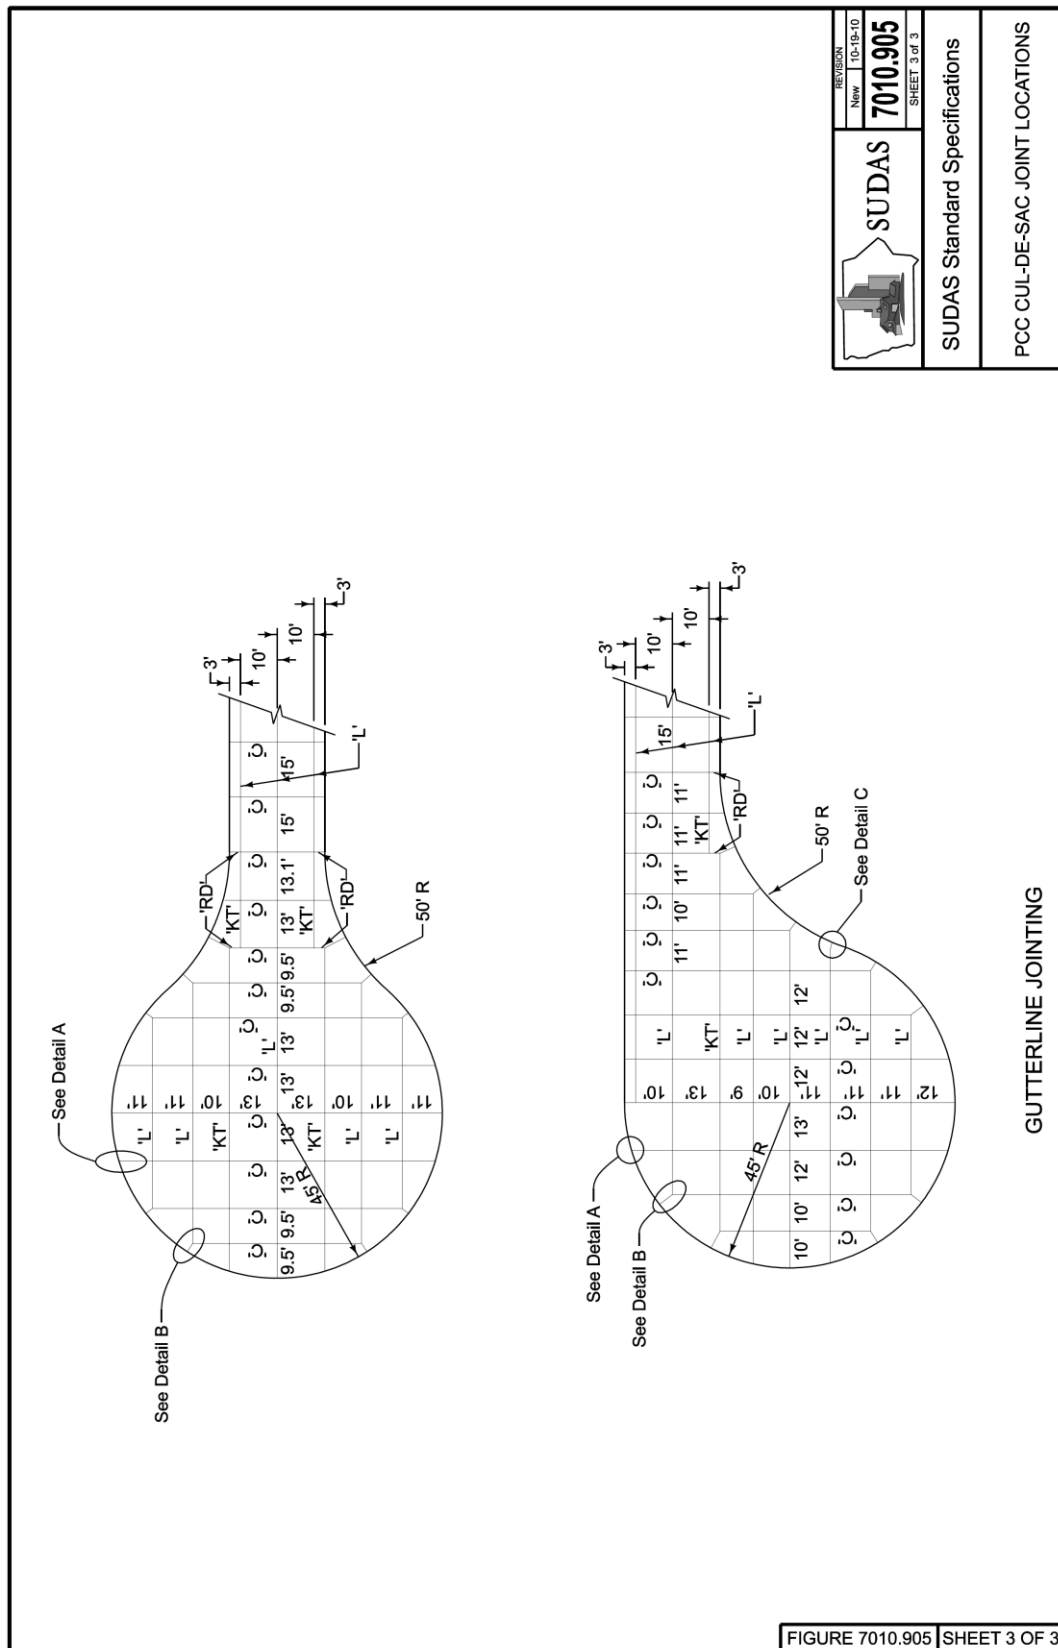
G-3.16: Cul-de-sac Joint Locations - Gutterline Jointing Examples
